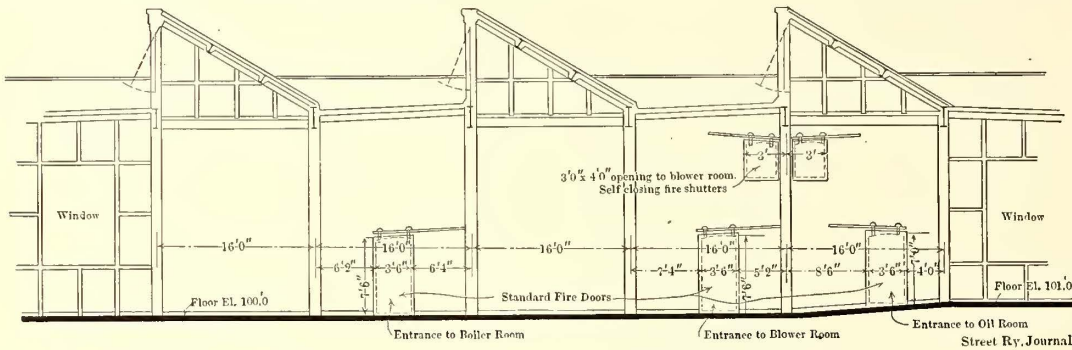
ELEVATION SHOWING FIRE DOORS AND SHUTTERS, LOOKING AT BOILER HOUSE FROM INSIDE OF INSPECTION SHED
